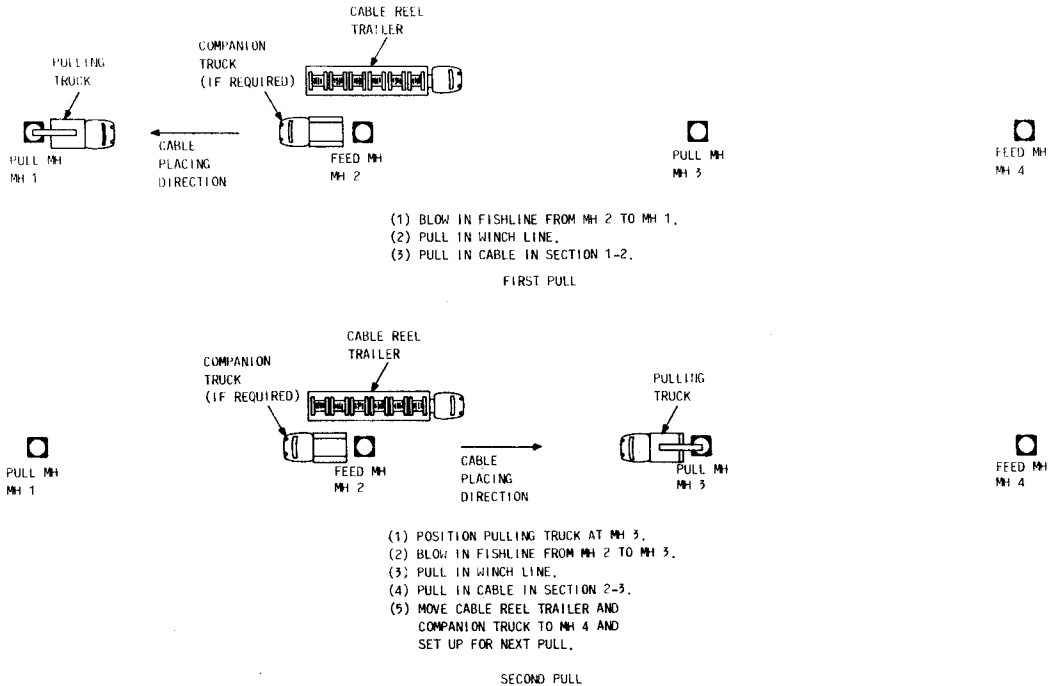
Method for Placing Cable Utilizing the B Fishline Kit
